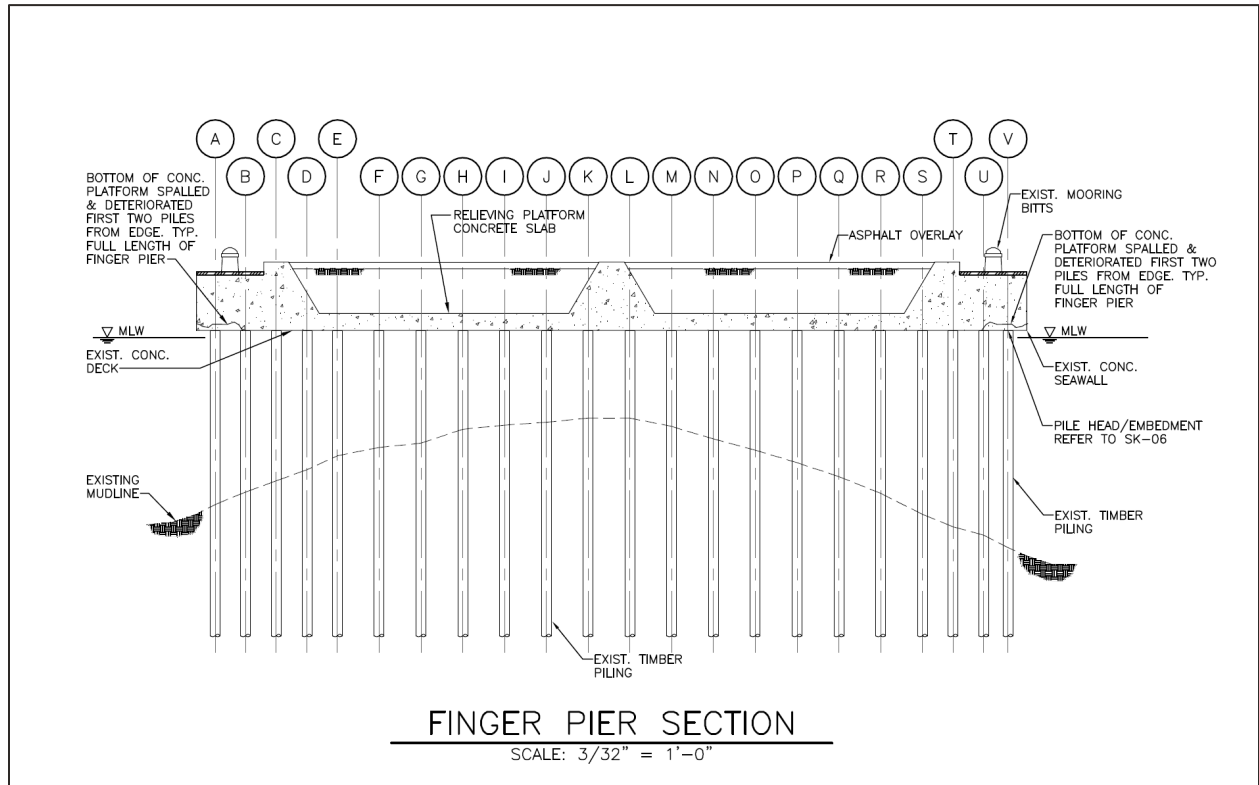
Typical Section - Canton Marine Terminal Pier 13
